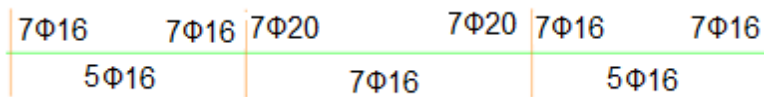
Beam Longitudinal-Steel Reinforcement.
